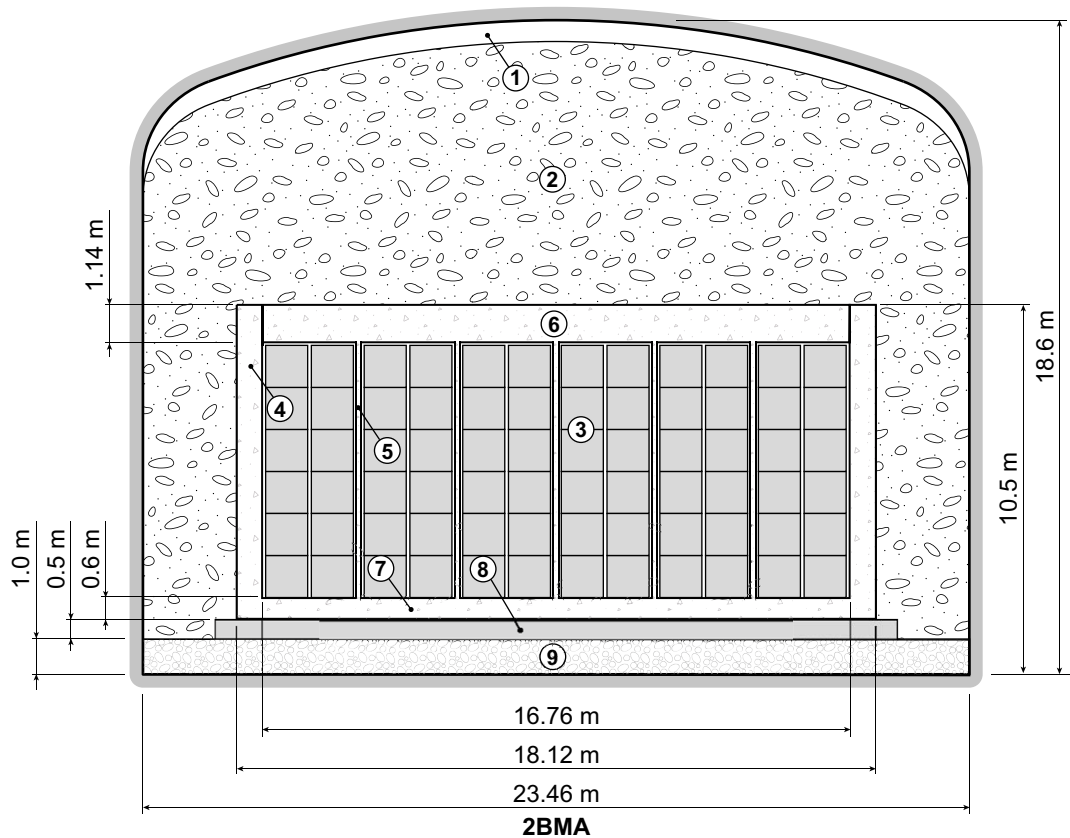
Schematic cross-section of 2BMA at closure. Key to numbering: 1) Void 2) Macadam backfill 3) Waste domain 4) Outer wall 5) Inner wall 6) Lid 7) Caisson slab 8) Slab 9) Crushed rock.
